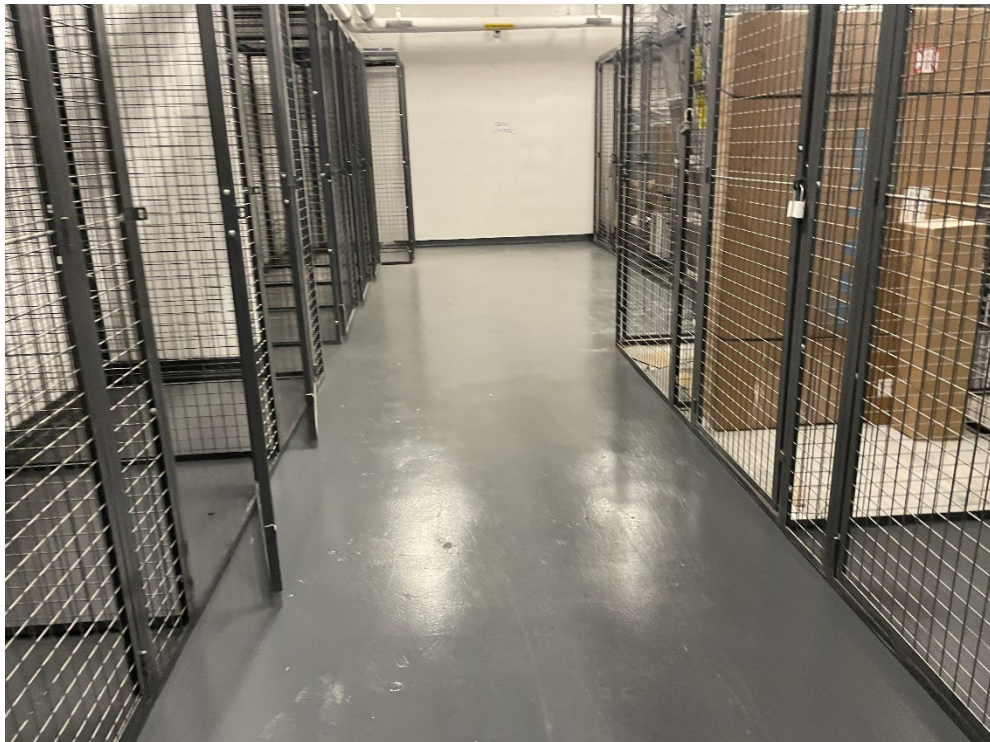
Photo of the concrete slab in the tenant storage room in the Site's cellar.
